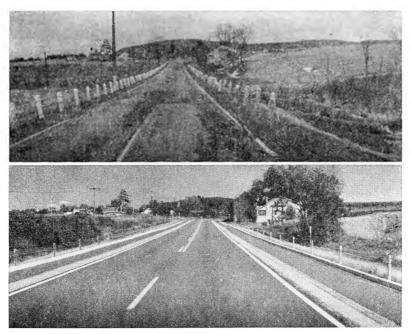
Pavement, Shoulder, and Guiderail Improvements
